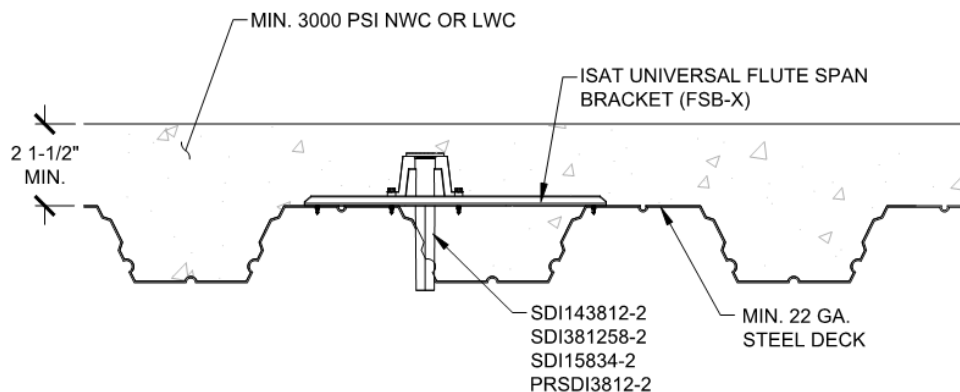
C - SDI-2 AND PRSDI3812-2 INSERTS INSTALLATION IN THE SOFFIT OF CONCRETE FILLED METAL DECK FLOOR AND ROOF ASSEMBLIES ABOVE LOWER FLUTE (W-DECK) - ELEVATED^{1,2,3}
